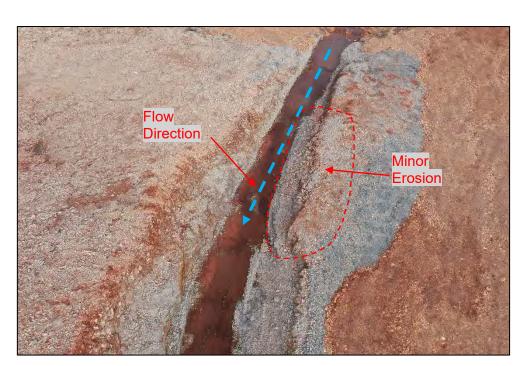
West Twin Dyke Spillway – Upper spillway, looking upstream from UAV. Note minor left bank erosion.
